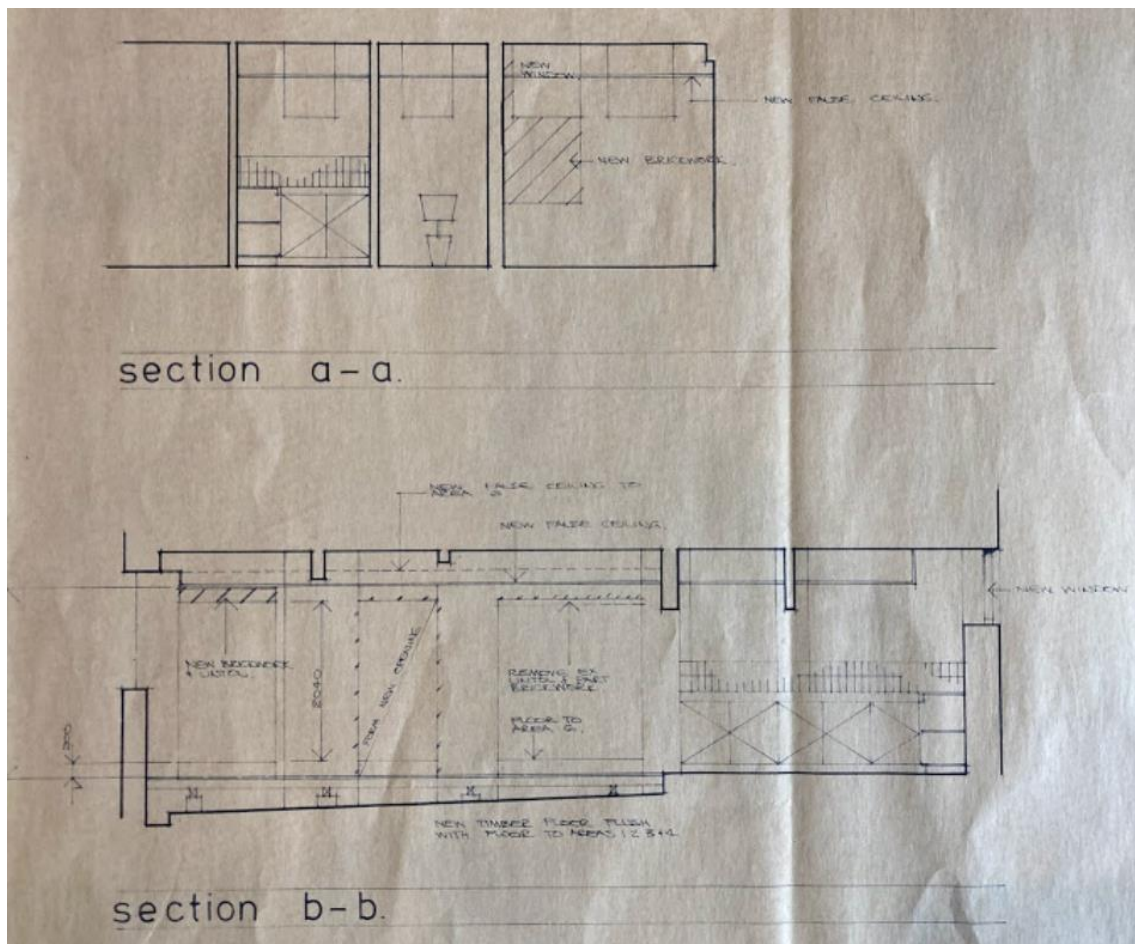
Elevations of new kitchenette and bathroom in Wilkinson House basement, 1984.
